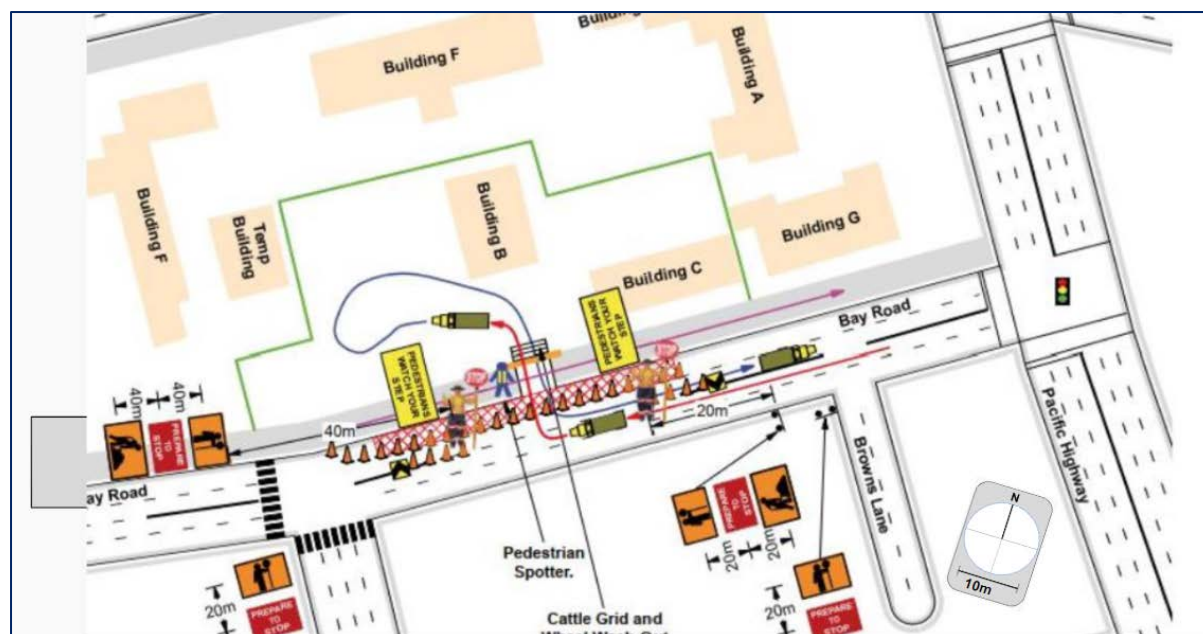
| Bay Road construction vehicle access and site manoeuvrability (Source: Applicant's Modification Application 2022)
